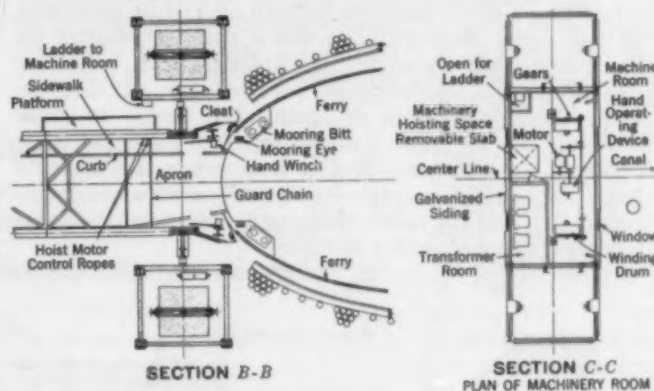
SECTIONS B-B AND C-C OF FIG. 2
